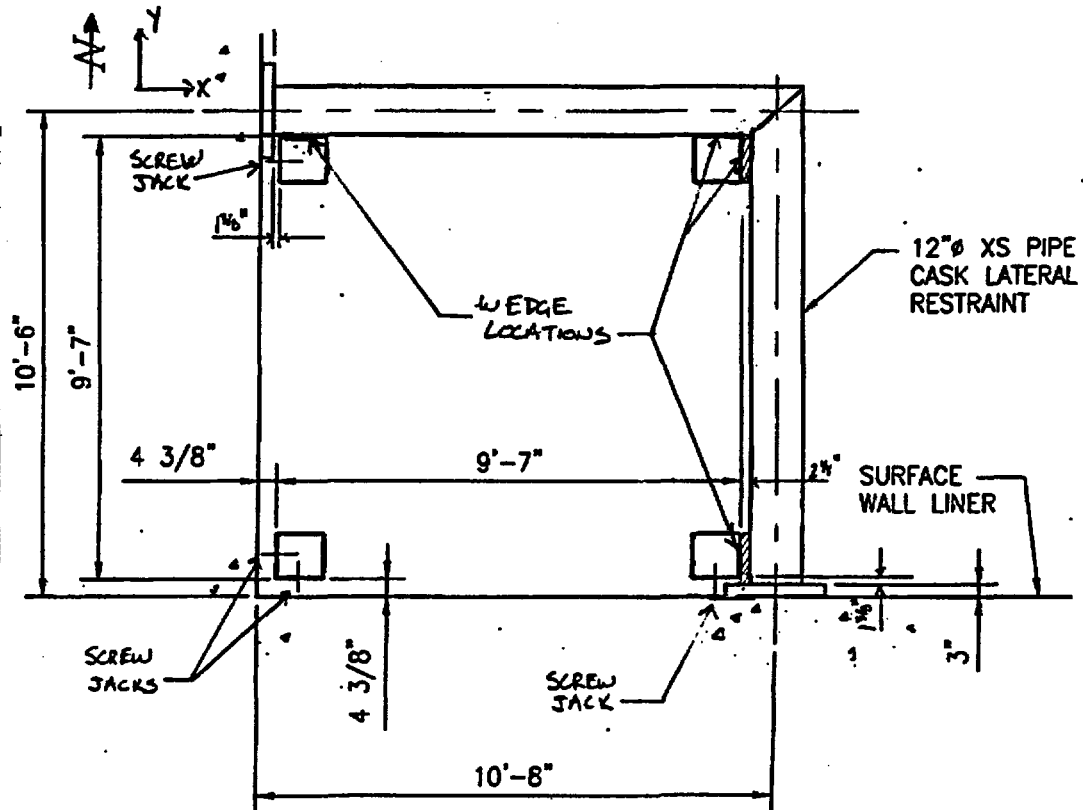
Cask Restraint at Elevation 111 ft 0 inches
